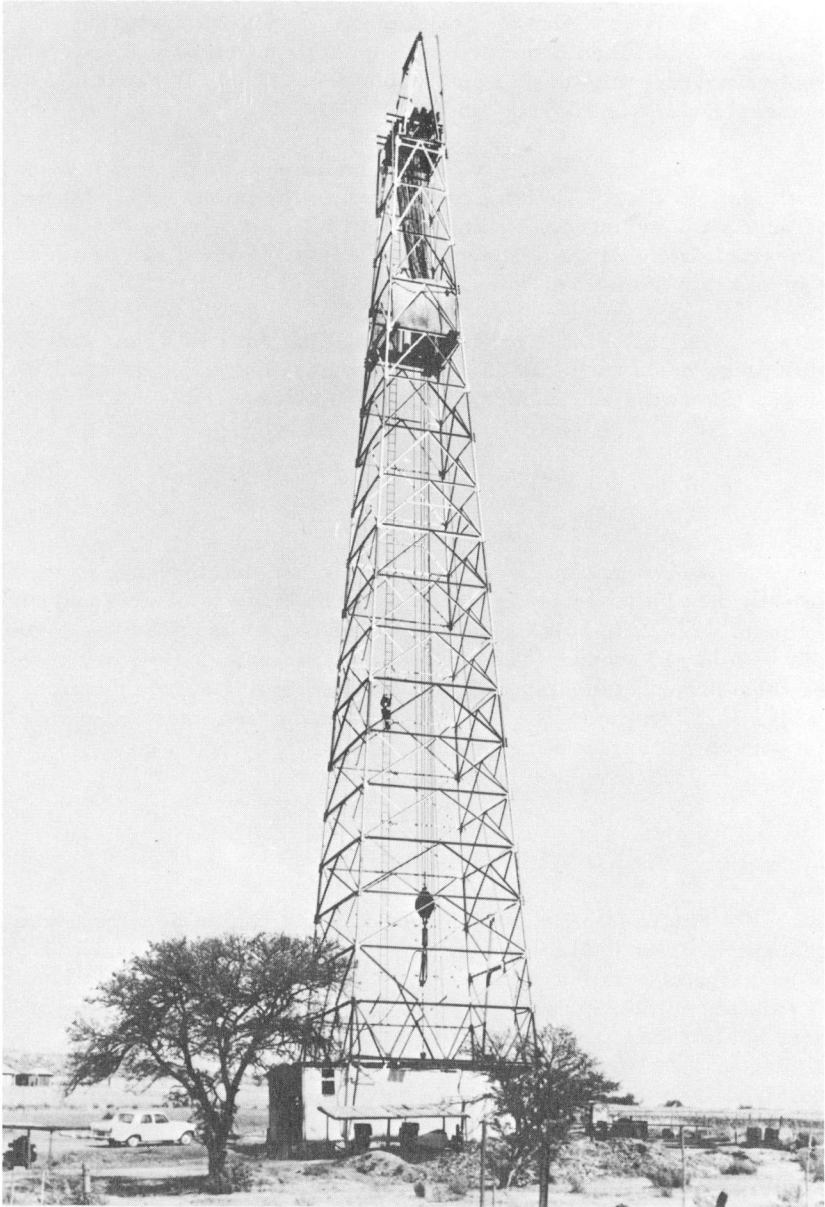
Locally built 136 foot derrick used with 120 foot rod stands on deep holes.
